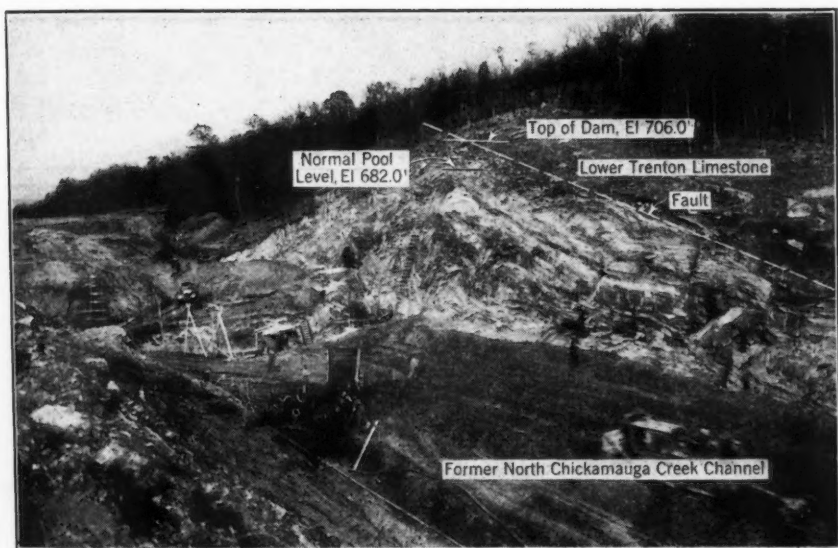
NORTH ABUTMENT SHOWING FOLDED AND FAULTED TRENTON LIMESTONE
